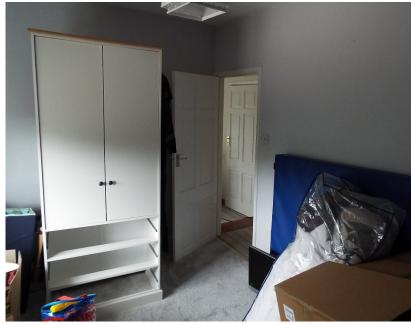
Ph 181. FF2 north and west Figure 46. Ph 183. FF2 south and west walls
